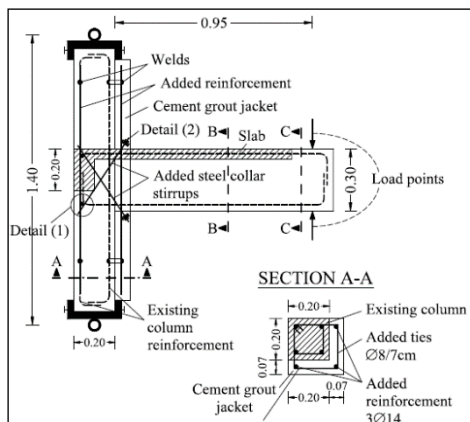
Specimen SP₂ detailing (Tsonos, 2010)
